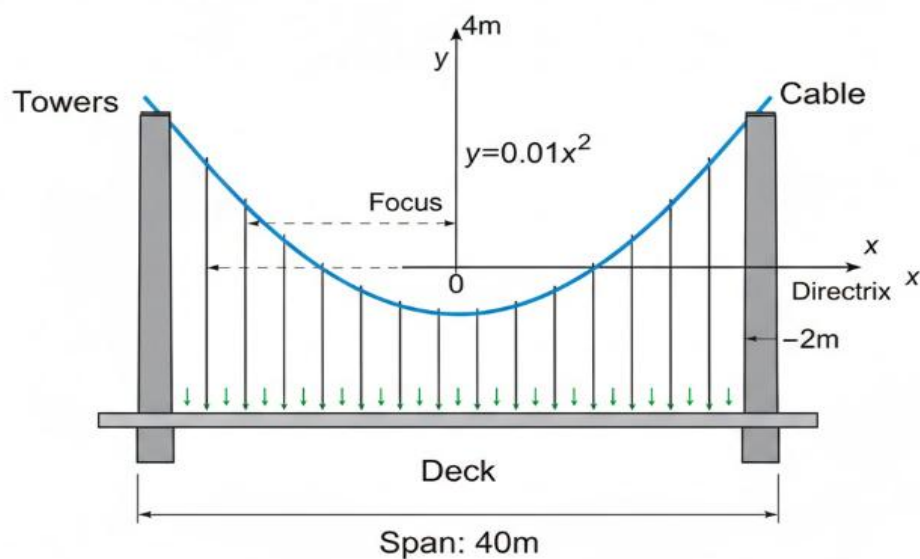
FIG: Deal Parabolic Cable in 40m Suspension Bridge Model
